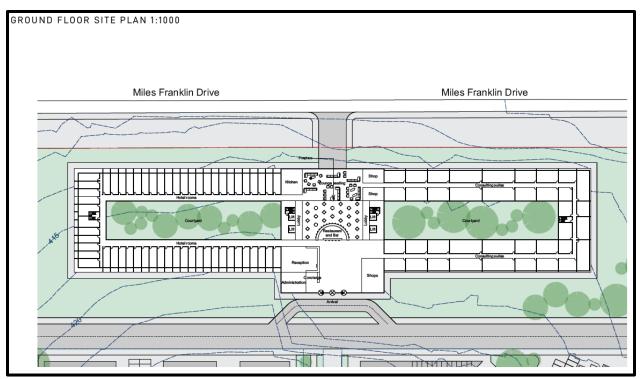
Spa Hotel Ground Floor Site Plan Site Plan (Source: Robert Harwood Architects)
